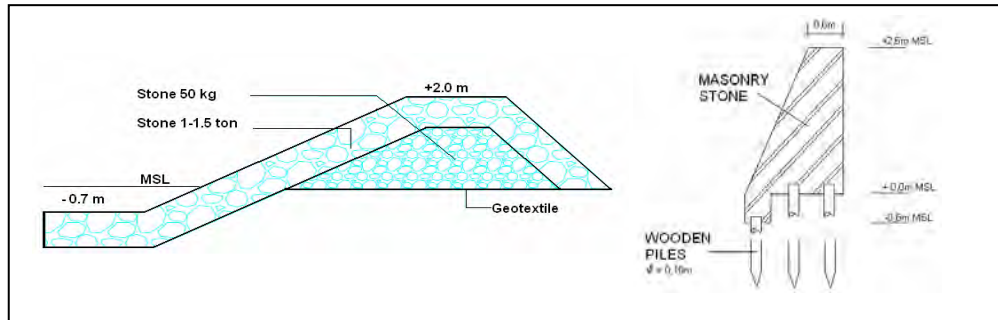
Cross section of existing revetment (left) and floodwall (right) [SDC]
